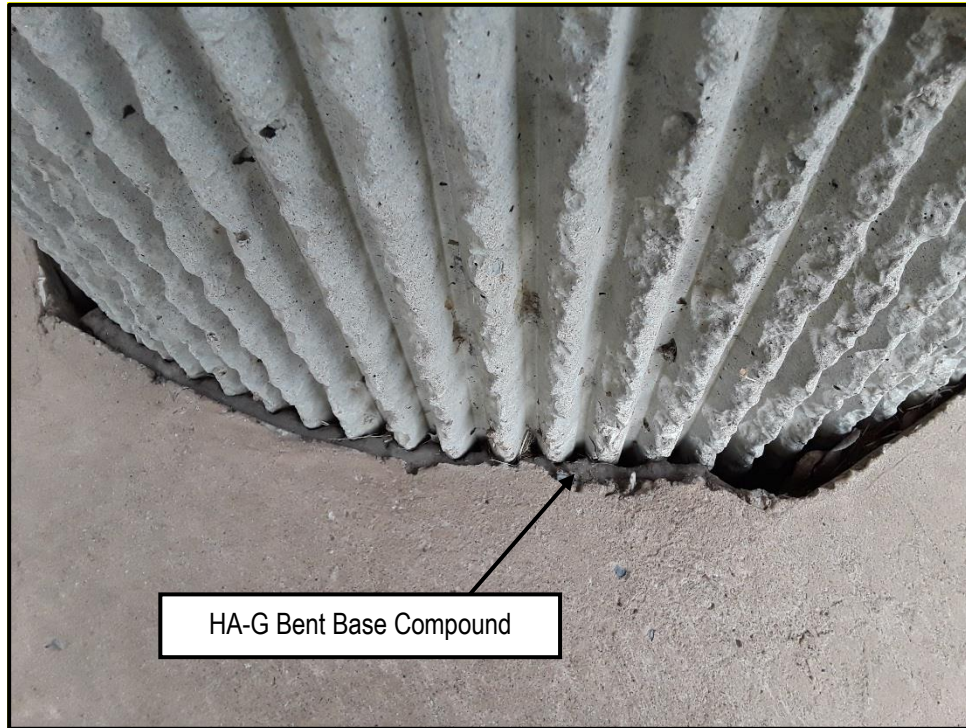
View of HA-G on the SR-1 Ramp over I-440
